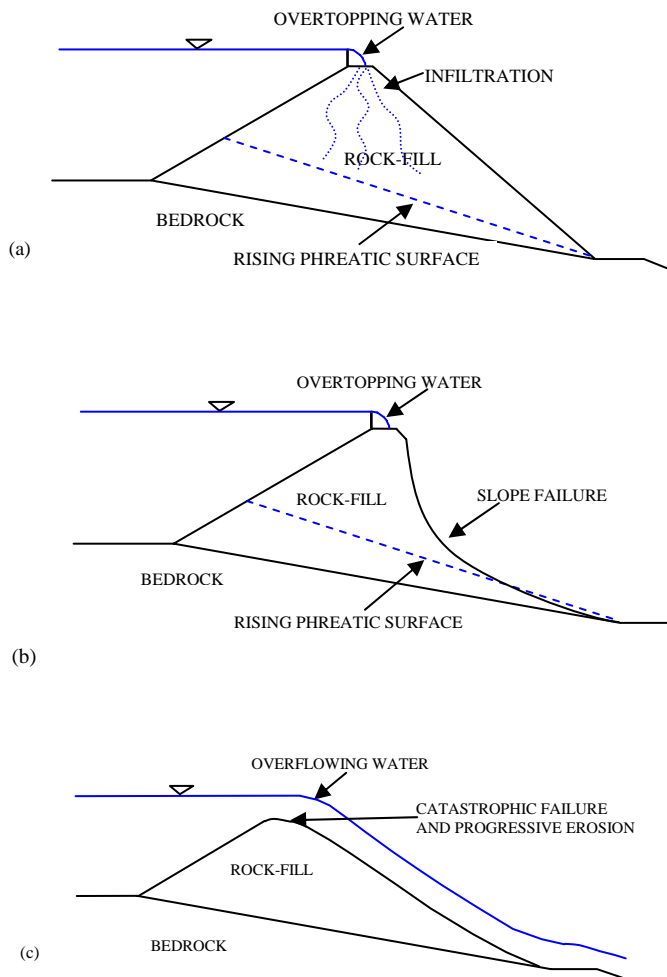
Failure mechanism #1. (a) rising phreatic surface, (b) slope instability, (c) catastrophic failure with progressive erosion (not to scale).
